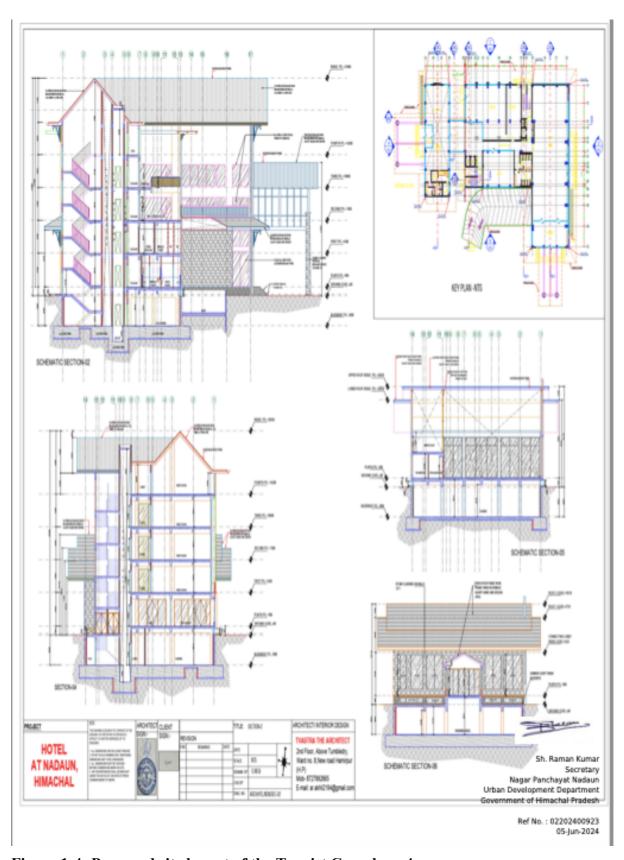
Proposed site layout of the Tourist Complex - 4
